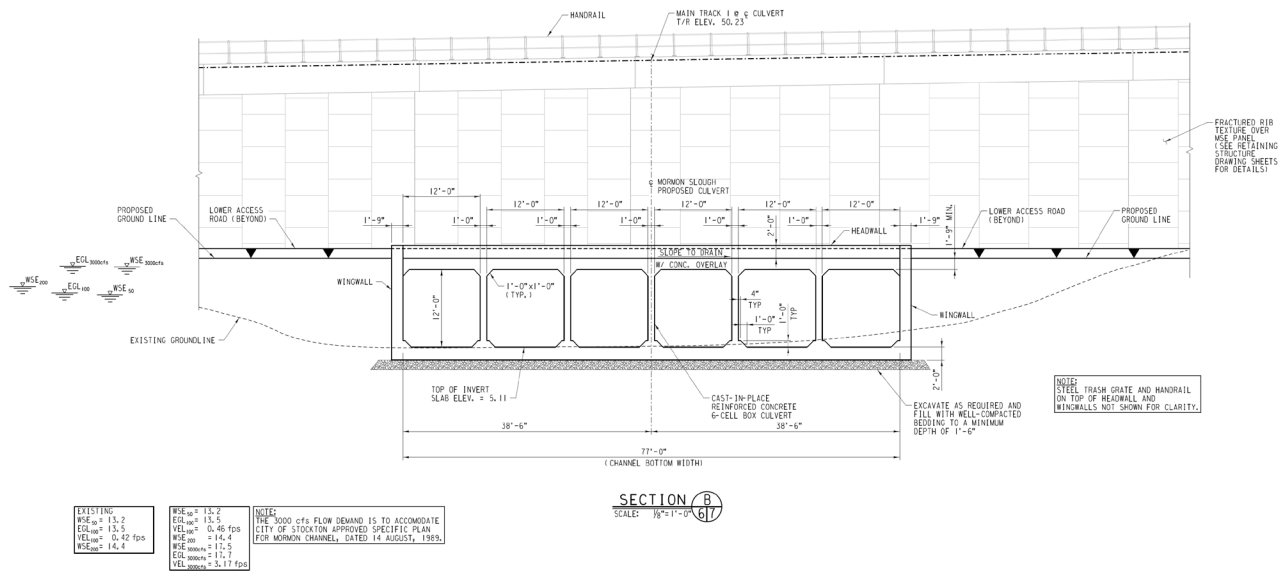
The proposed six-cell culvert. The proposed culvert will be 77 feet wide and 261 feet long and will create five one-foot-wide piers in the Mormon Slough with 12-foot-wide and 12-foot-tall openings between each cell (HDR 2024).
